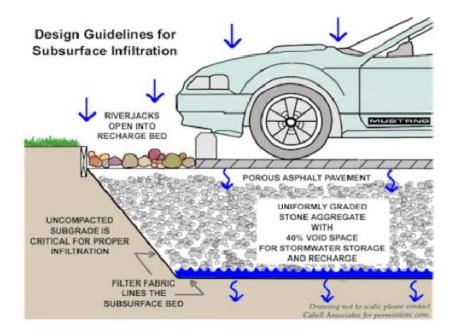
Typical Porous Pavement Cross Section (Cahill Associates 2006)
